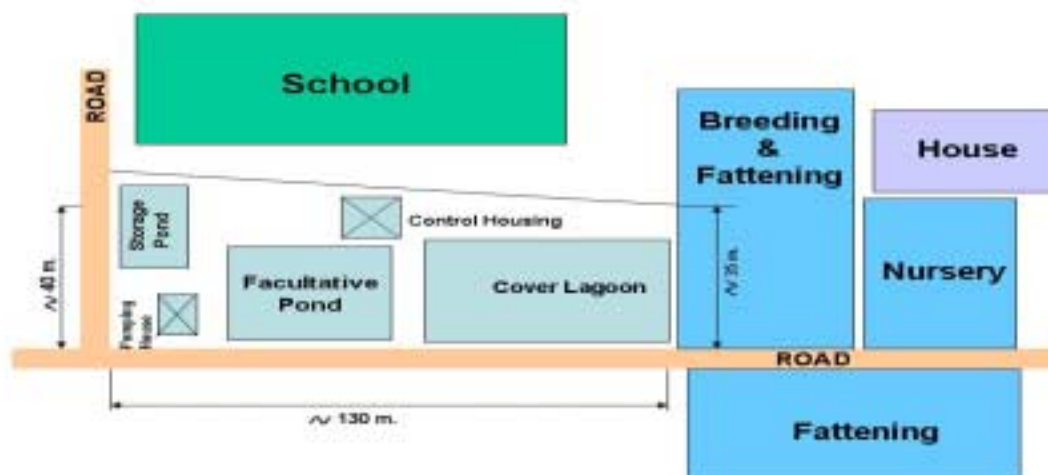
Proposed Plan Layout for Sa-ard Farm (Option)
